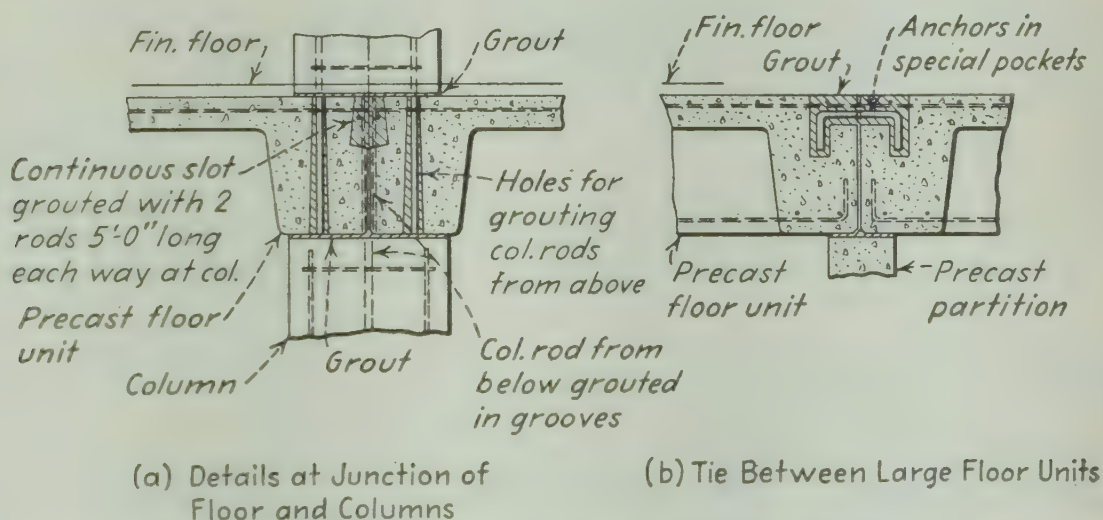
Some details of precast construction for multistory buildings. (Patterned after work of Vacuum Concrete, Inc., Philadelphia, Pa.)
